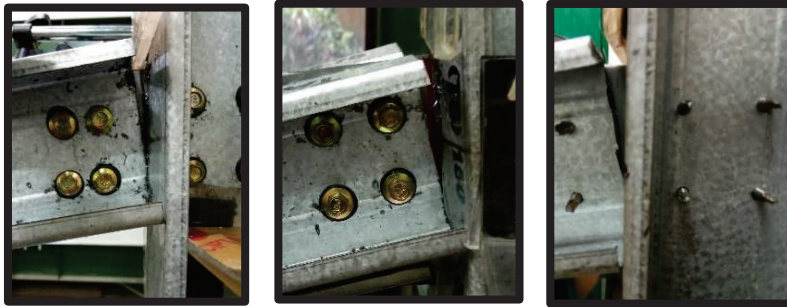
Failure of the gusset-plate screw connection.
